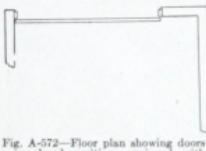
Floor plan showing doors in closed position, equipped with "SlydaSyde" GG hardware.
